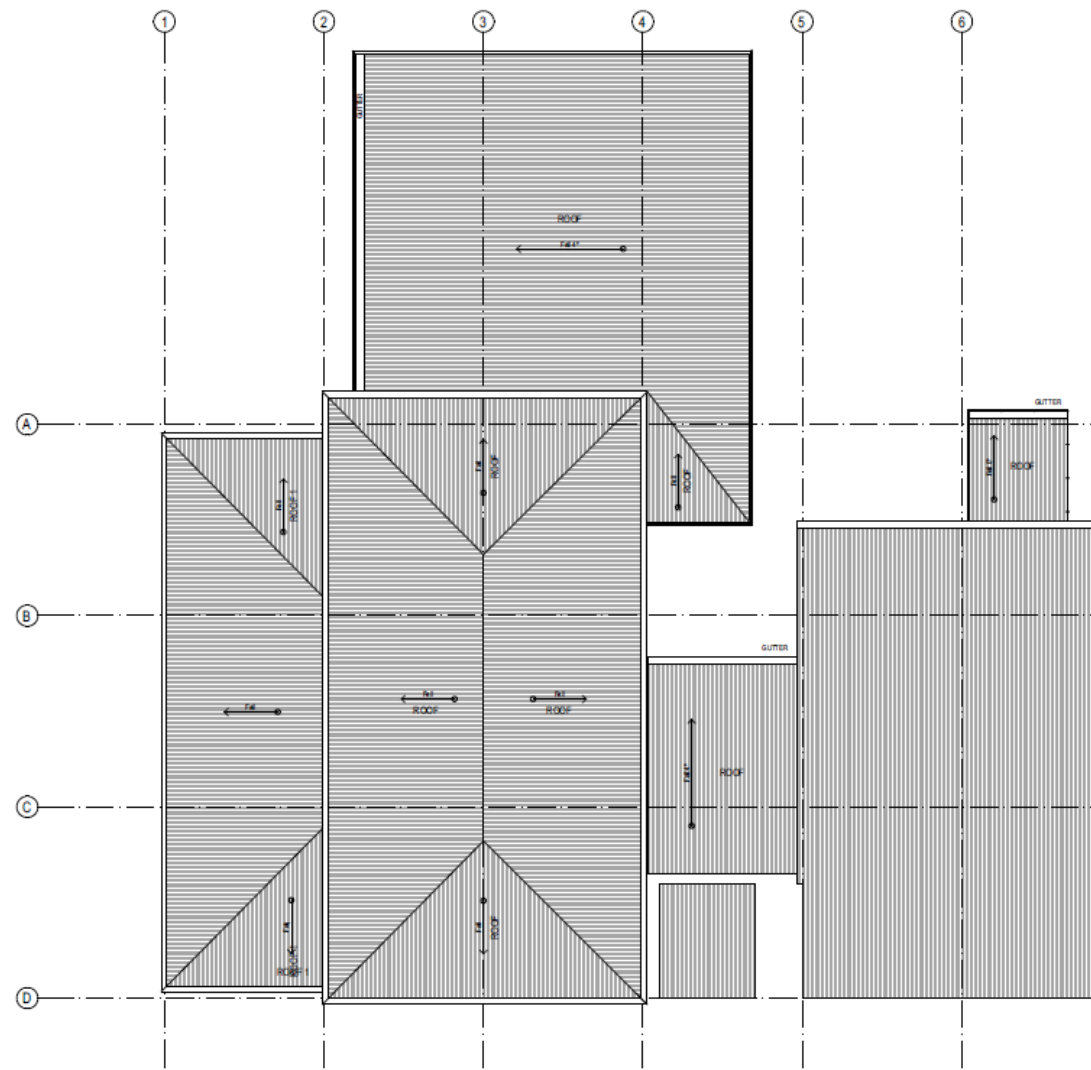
Building J Roof Plan. Source: Fulton Trotter, 2021; Drawing No. SD-2006, Rev F, 13.8.2021.
